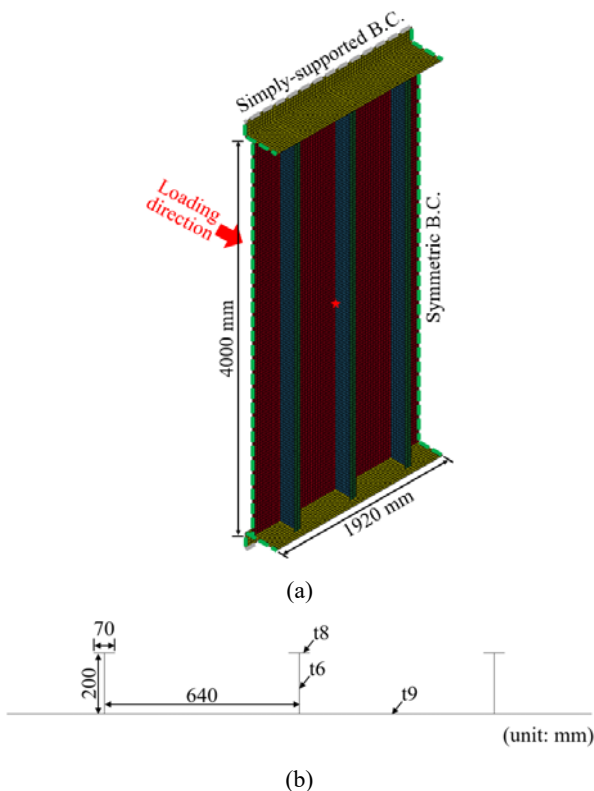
(a) Numerical model and (b) cross-section configuration of hybrid blast wall
